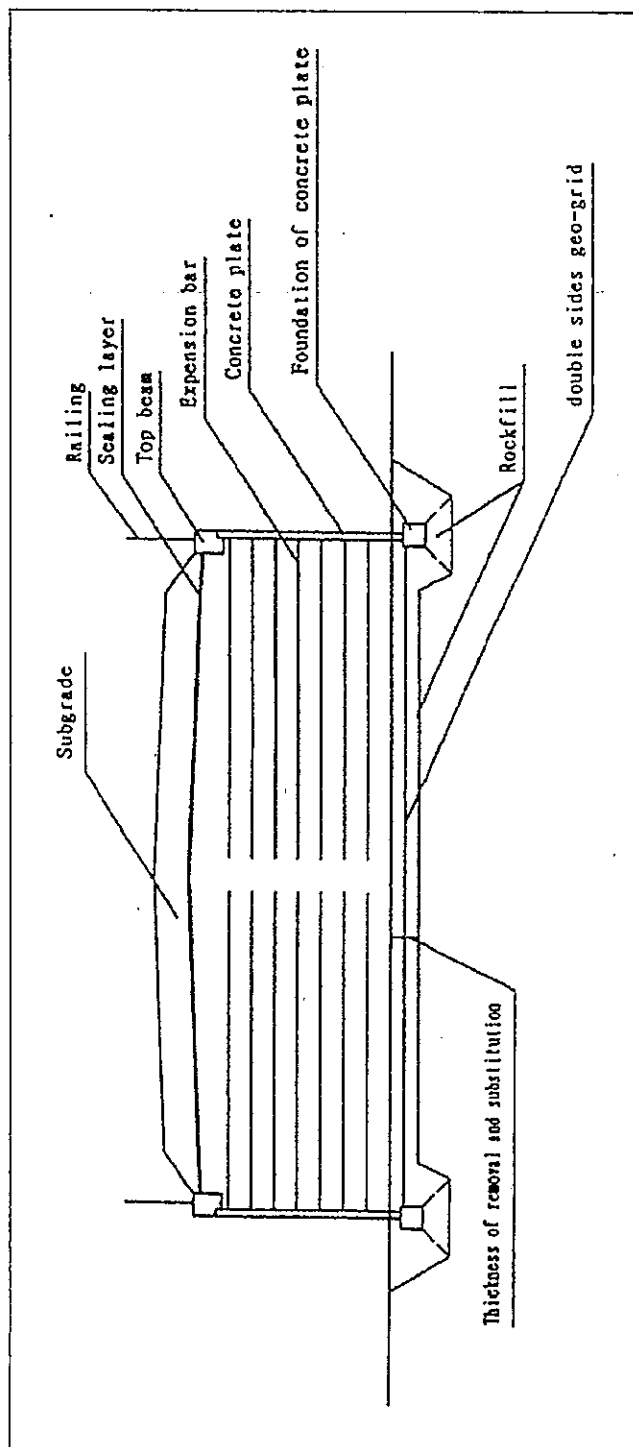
Retaining Wall in Embankment with Improved Formation
